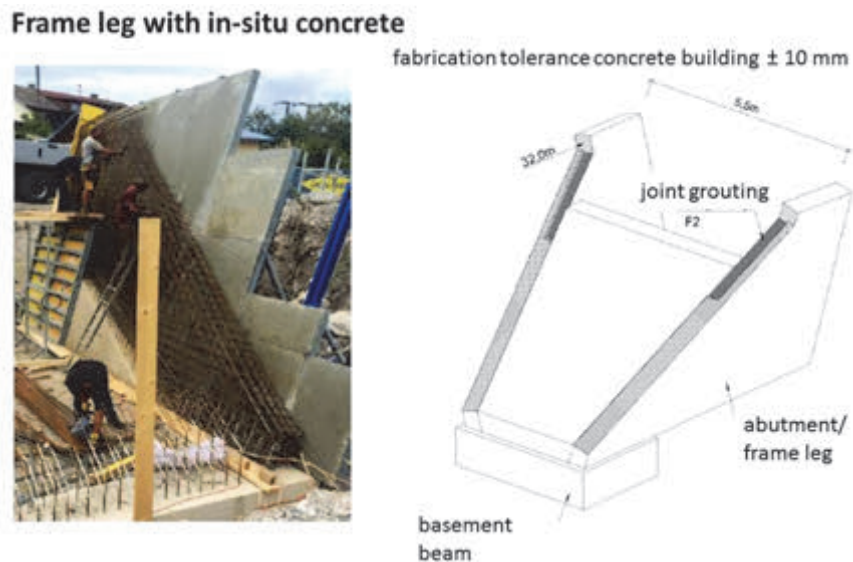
Fabrication and design of the frame leg with in-situ concrete
